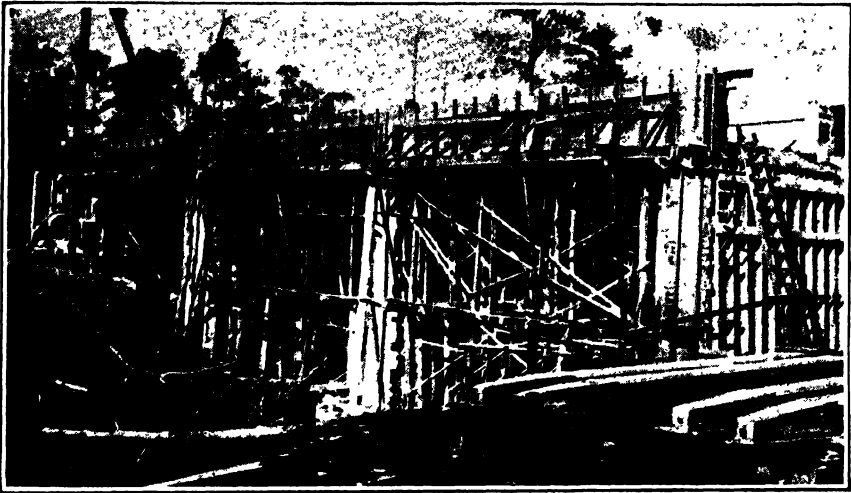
Panel forms for bridge abutments—U. S. Reclamation Service.
